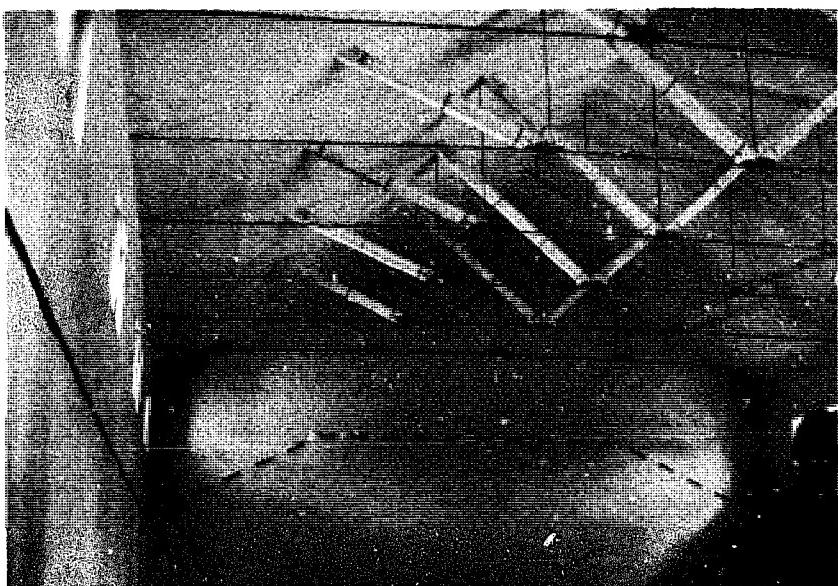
Bulk grain warehouse. Trusses wood/steel ca 150 cm. Ceiling of plastered reed mats. Note line on walls indicating pile height. (Zhuang Xi Depot)
